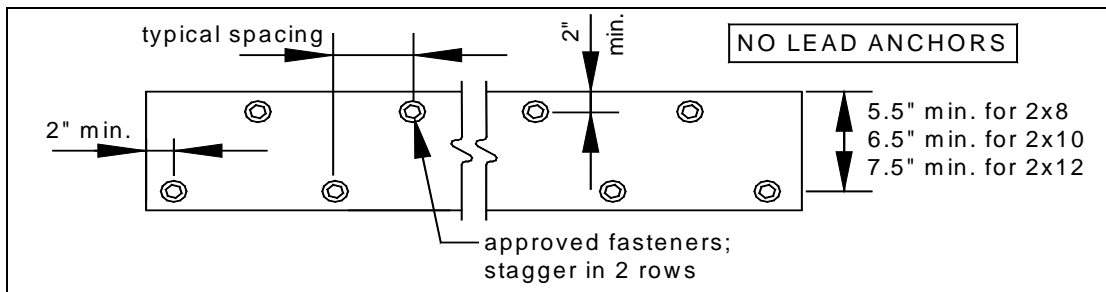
LEDGER BOARD FASTENER SPACING AND CLEARANCES
